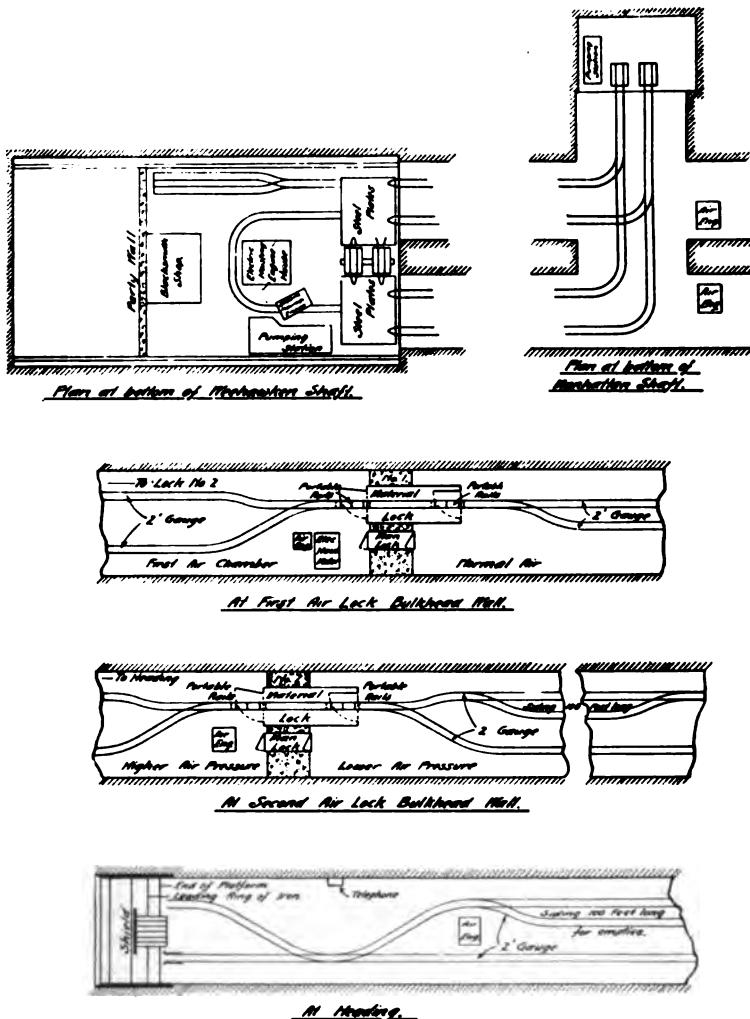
Plans of tracks, sidings and switches in a compressed air tunnel (A-18).
